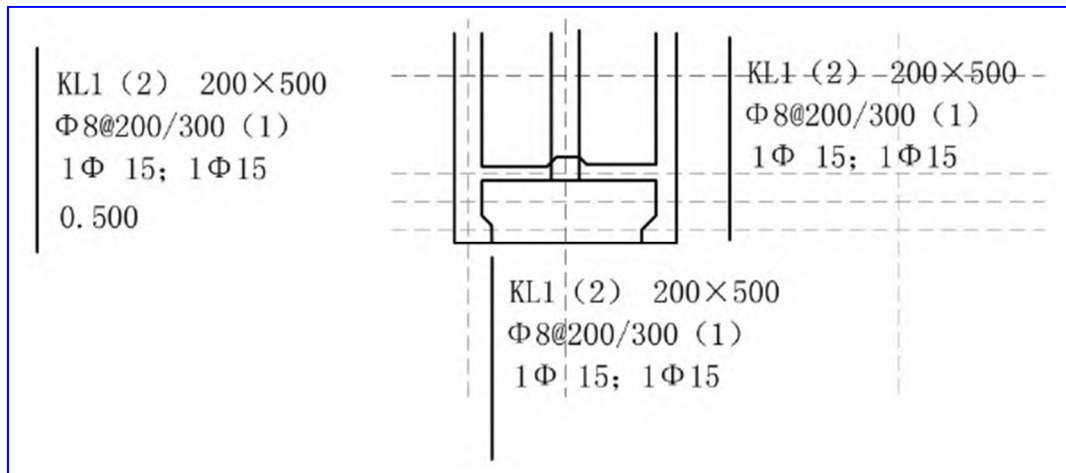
The label family of beam members in the design of a building structure and the schematic diagram applied in the flat construction drawing
